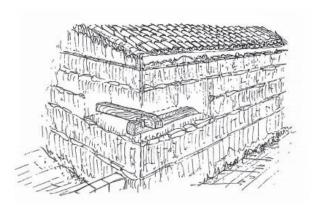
L-shaped element at the corners, inside the rammed-earth walls.
